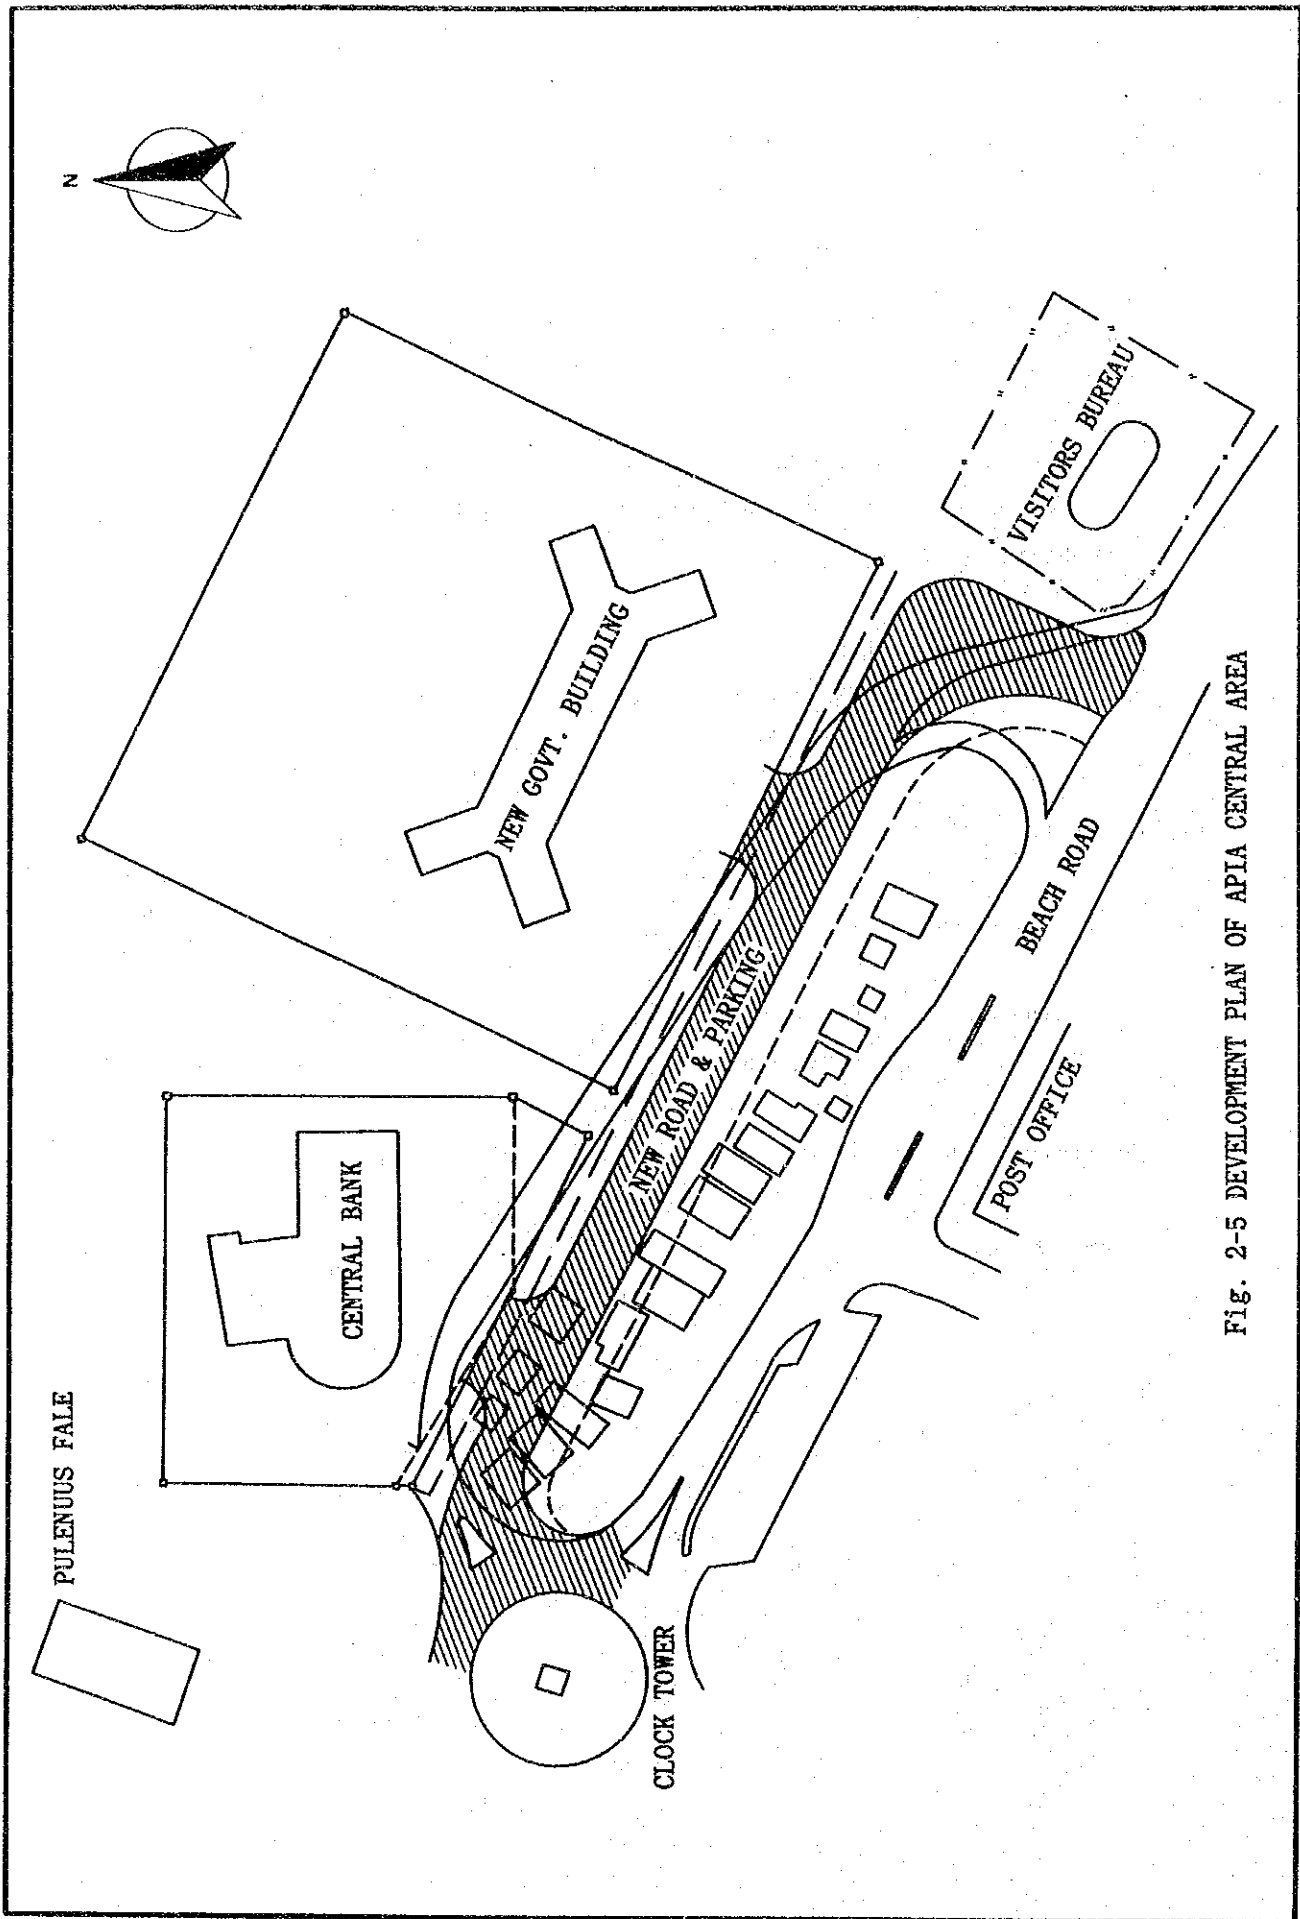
DEVELOPMENT PLAN OF APIA CENTRAL AREA
